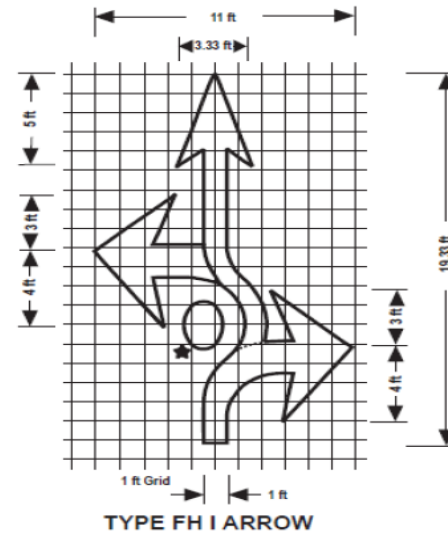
C-2 (CA). Lane - Use Arrow Pavement Marking Option for Roundabout Approaches
